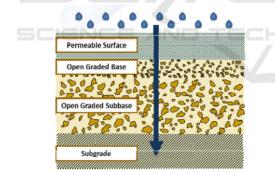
Permeable pavement system infiltration (Hein and Schaus, 2013).
